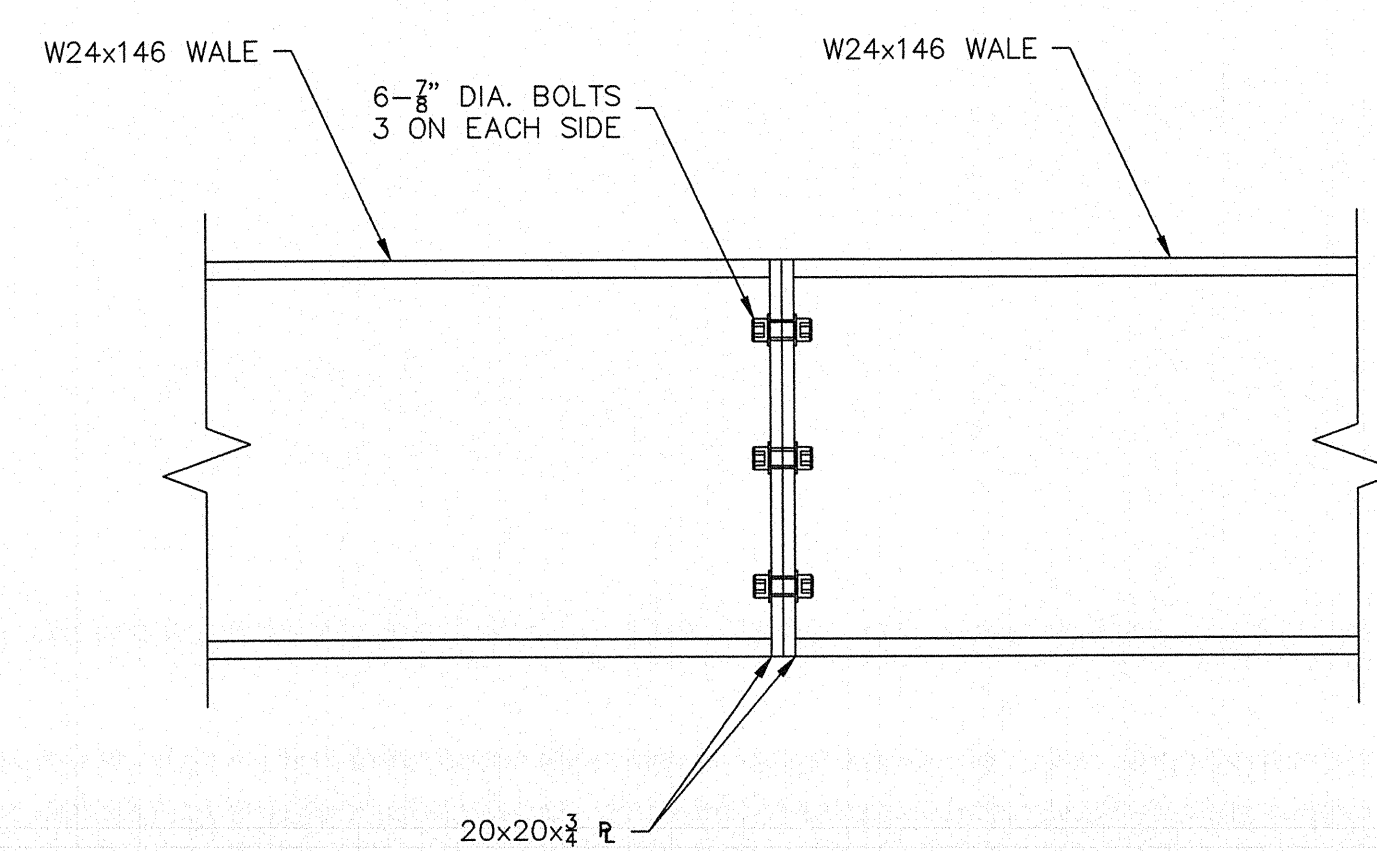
TYPICAL WALE CONNECTION @ KNEE BRACE (SECTION VIEW)
